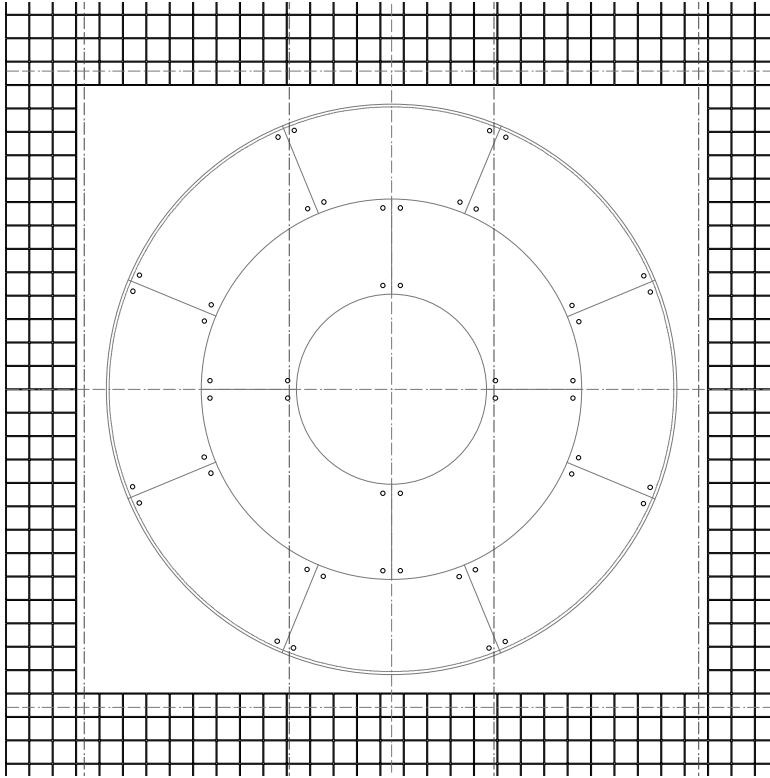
Centroid design showing sections to accommodate BART staff access to ceiling conduit
